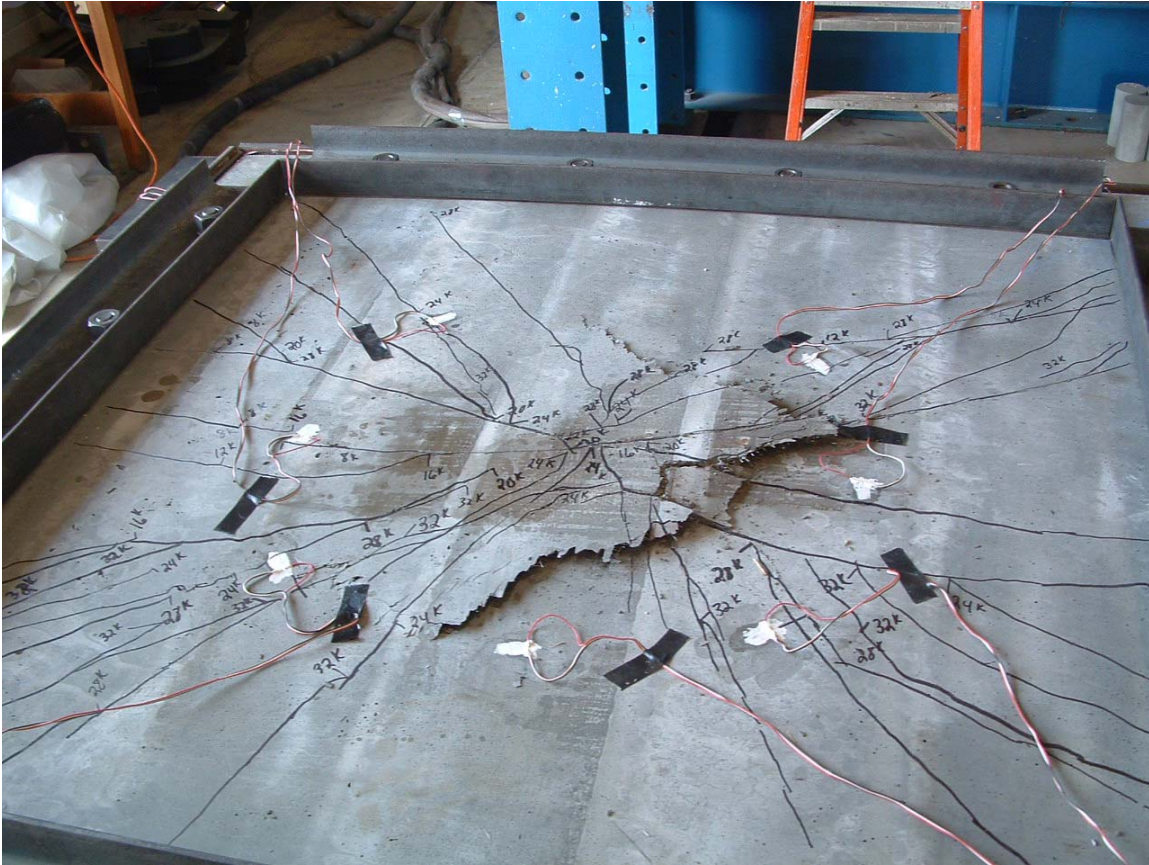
Failure Surface (2.5 in. slab – 2.0 in. plate)
